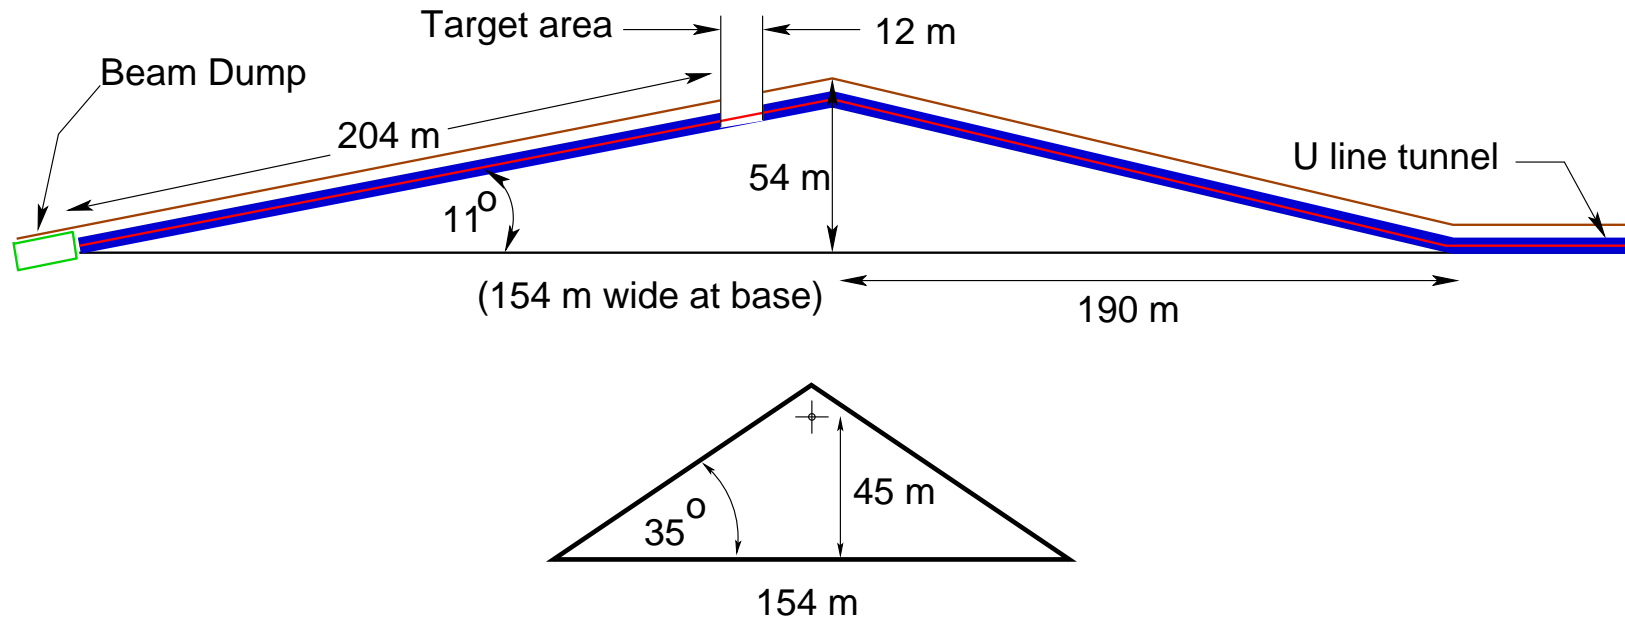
Elevation view of the neutrino beam line to Homestake, South Dakota. For a nearer location a much smaller hill can be constructed. In this beam we assume a decay tunnel length of 200 m. For a shorter tunnel the cost of the hill will reduce as shown in Table 1.
